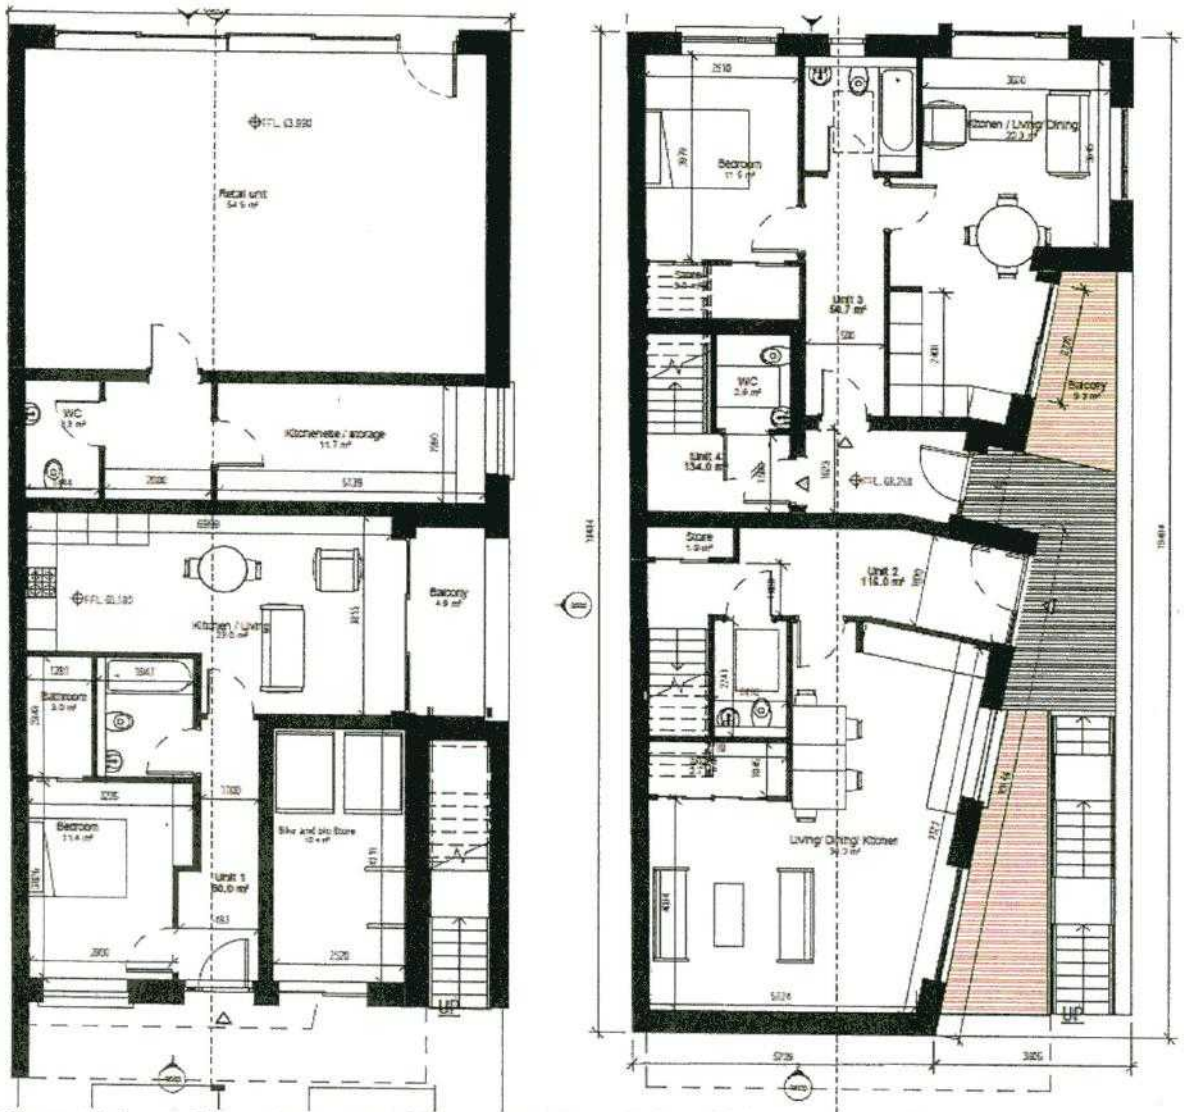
Ground floor plan (left) and first floor plan (right) of the proposed development.
